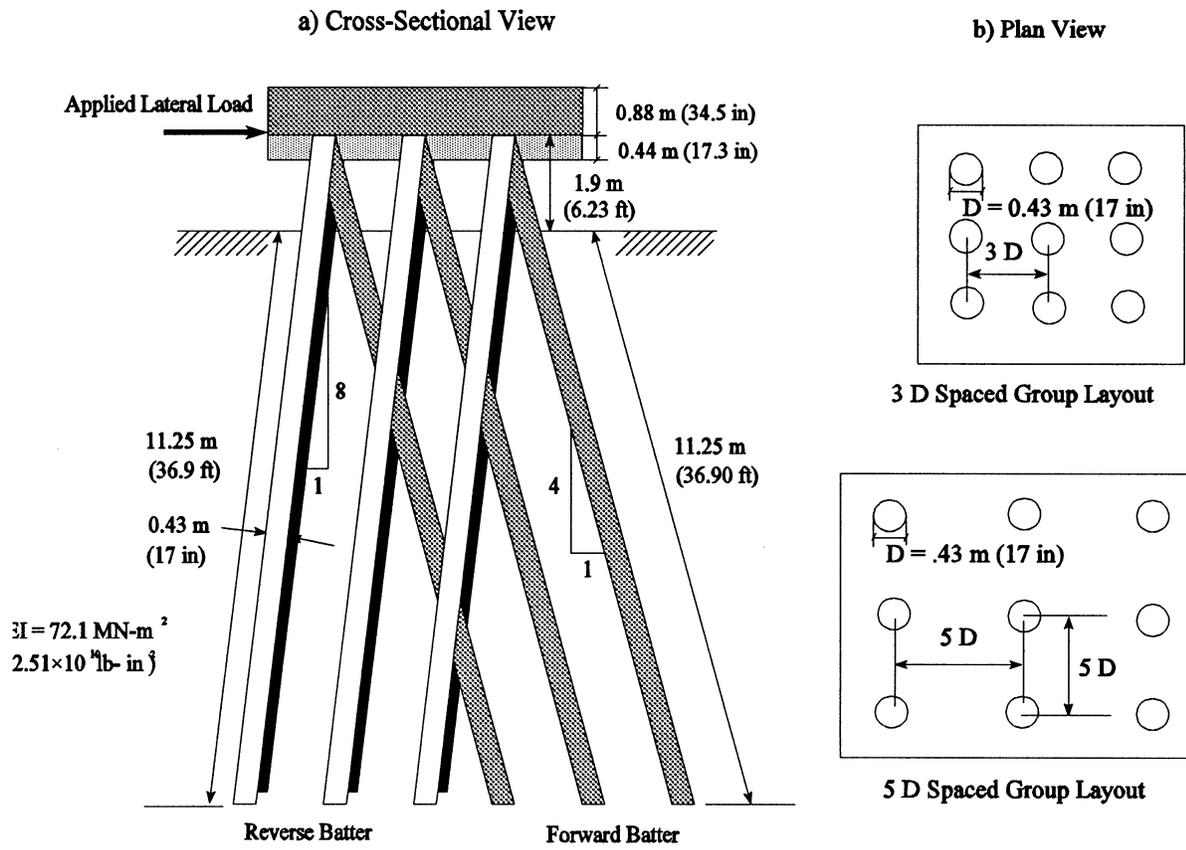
Cross-Sectional and Plan View of 3x3 Battered Pile Group Study
